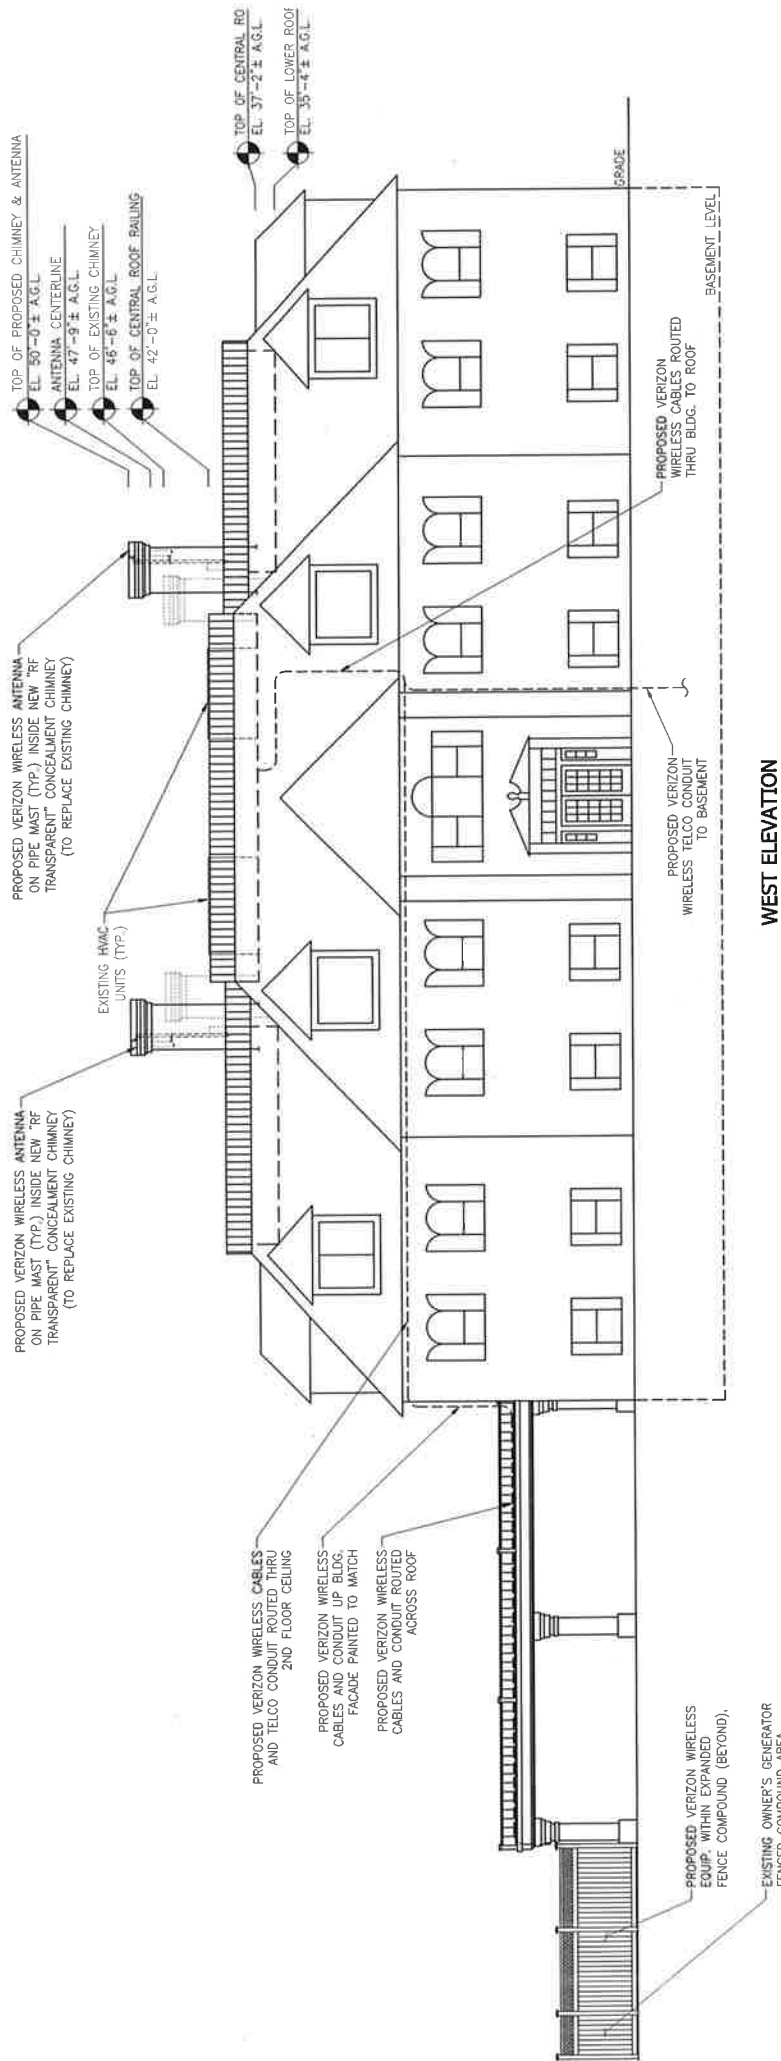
PROPOSED EQUIPMENT LOCATION AND ELEVATION PLAN
